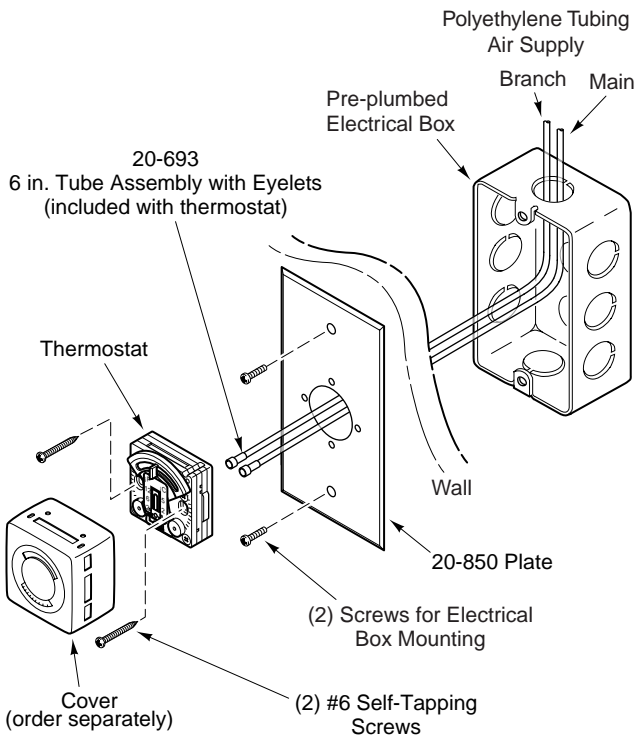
Flush Mounting of Thermostat, Using 20-850 Plate and Pre-Plumbed Electrical Box.
